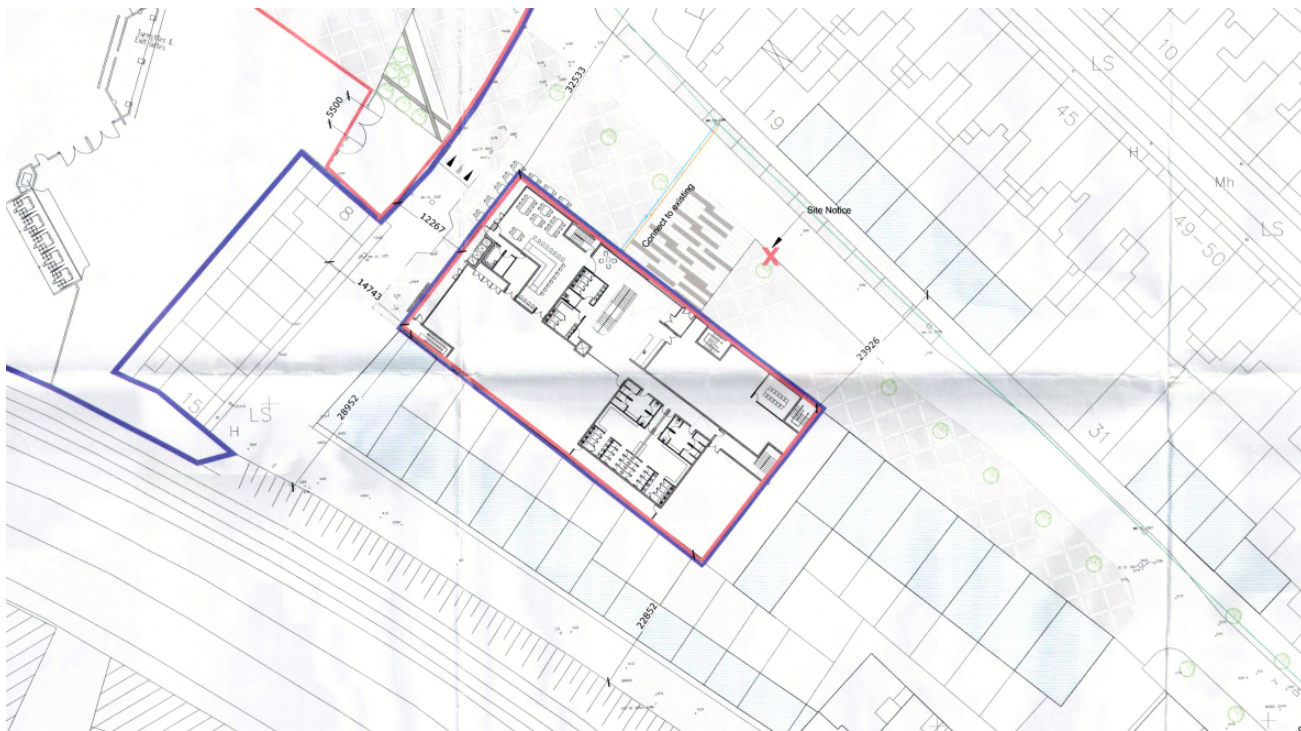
Permitted Site Layout under PA. Reg. Ref. 3789/20
